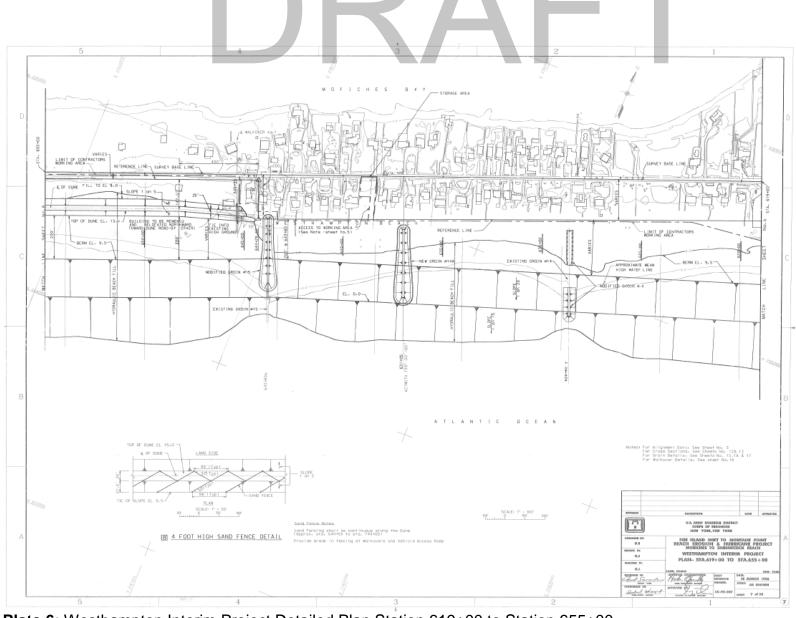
Westhampton Interim Project Detailed Plan Station 619+00 to Station 655+00
